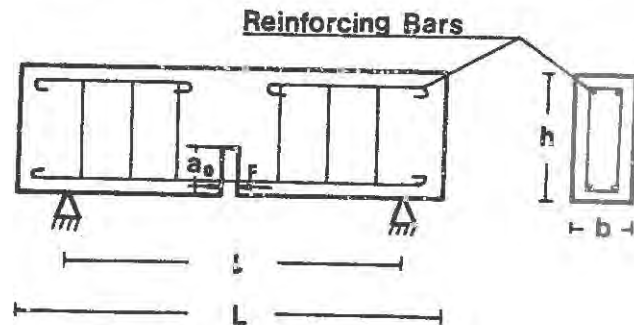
The Configuration of Specimen and the Arrangement of Reinforcing Bars
